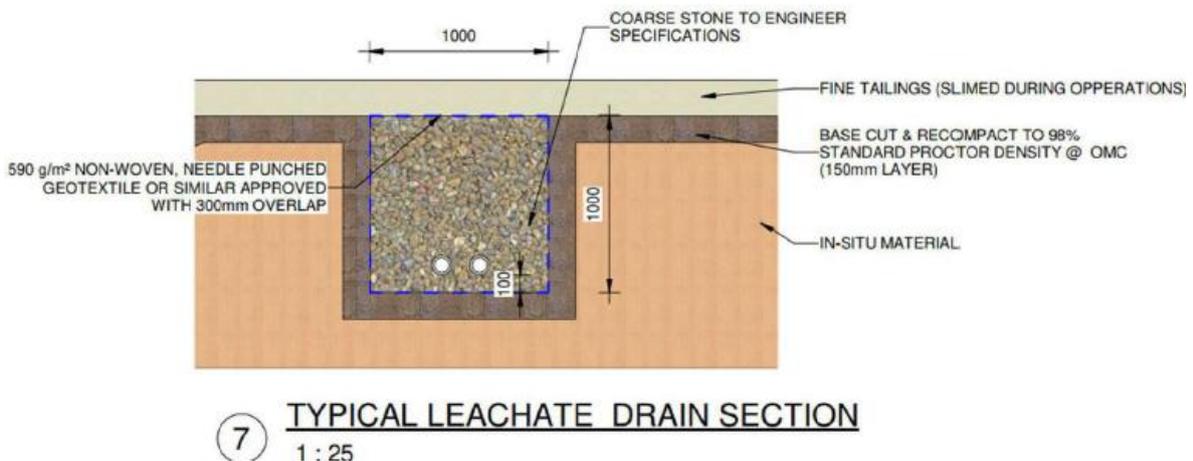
Typical Leachate Drain Detail (Eco Elementum, 2025)
